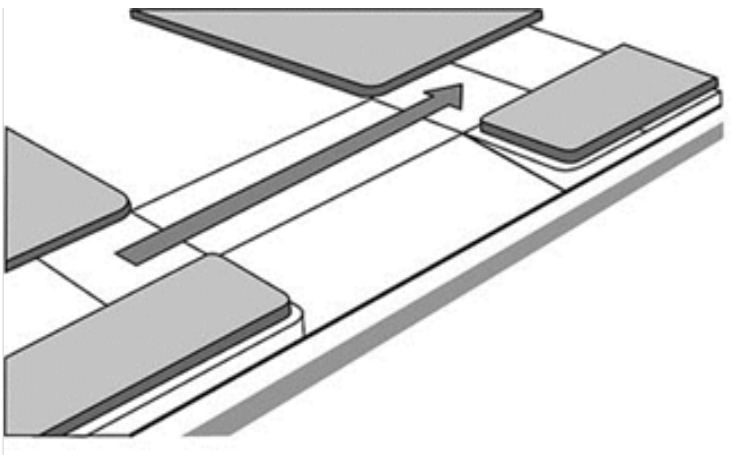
Primary driveway designed as a street, leading to off-street parking located behind the primary structure. Primary driveways in the Employment Center District should be designed as streets and should include pedestrian facilities such as raised sidewalks.
